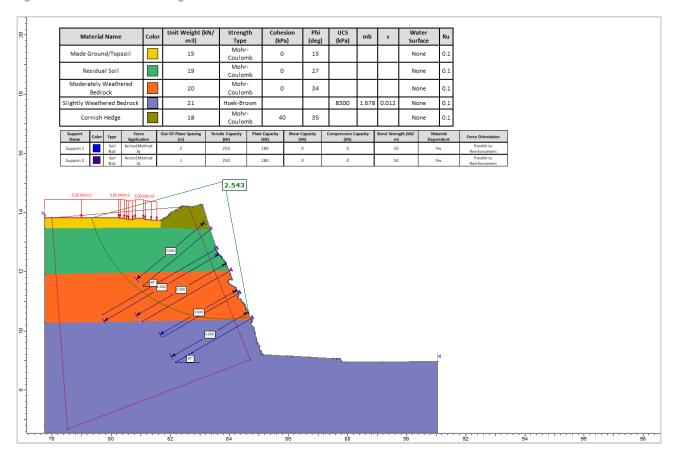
Section 5 – Soil Nailing - BS8006 Set2
